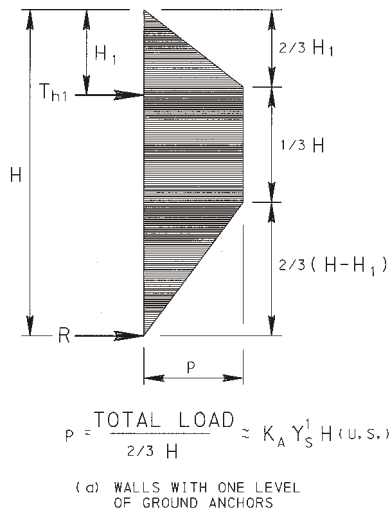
(a) – Apparent Earth Pressure Distribution for Anchored Walls Constructed from the top down in Cohesionless Soils
